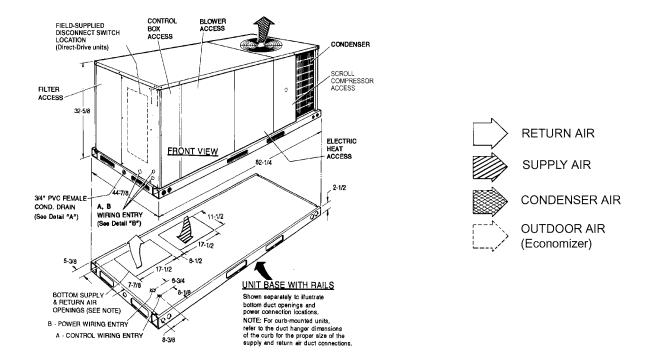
UNIT DIMENSIONS (3 - 5 TON COOLING ONLY/ELECTRIC HEAT) FRONT VIEW
